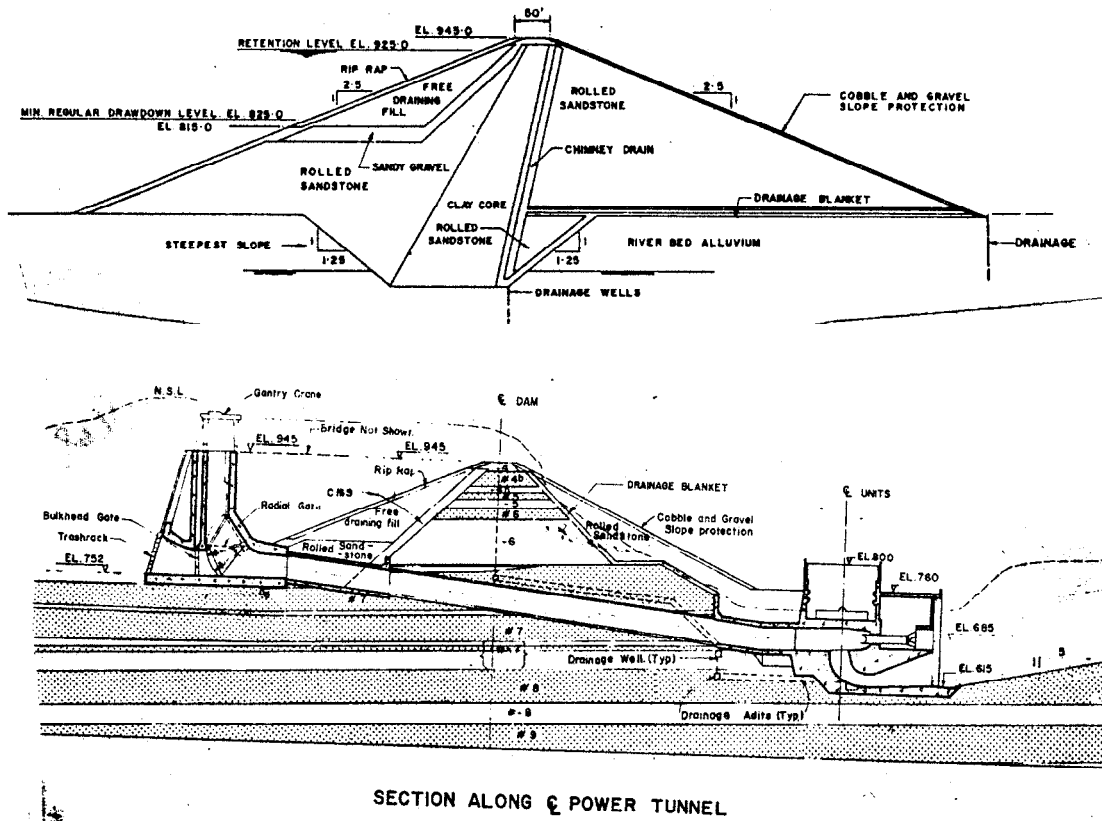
Kalabagh Dam - Plan and Few Structure Cross Sections
